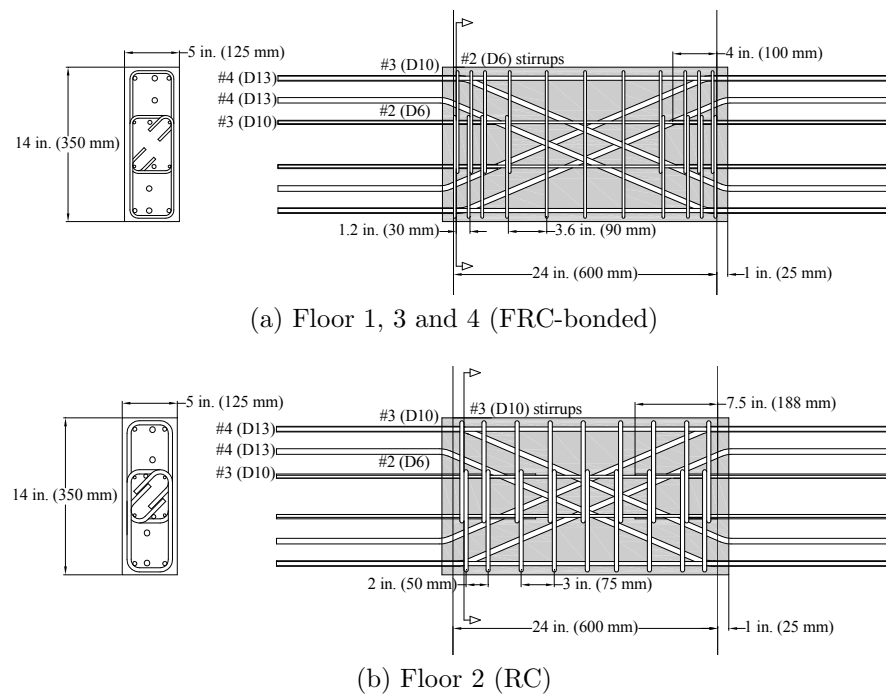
Coupling beam reinforcement detail for CW2 (Lequesne et al., 2010)
